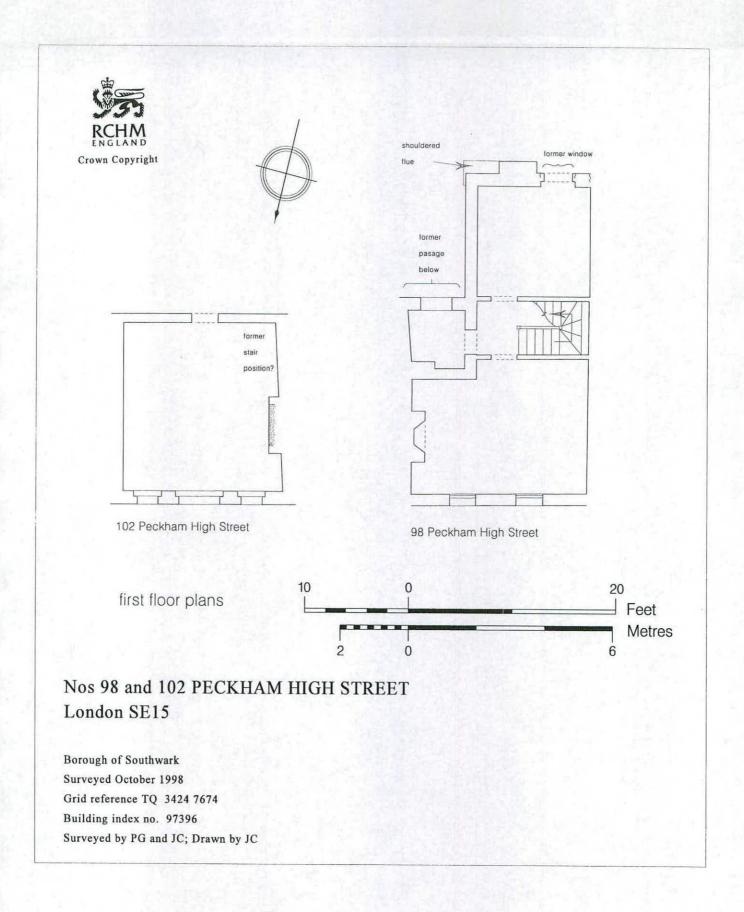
Nos 98 and 102 Peckham High Street, first-floor plans.
